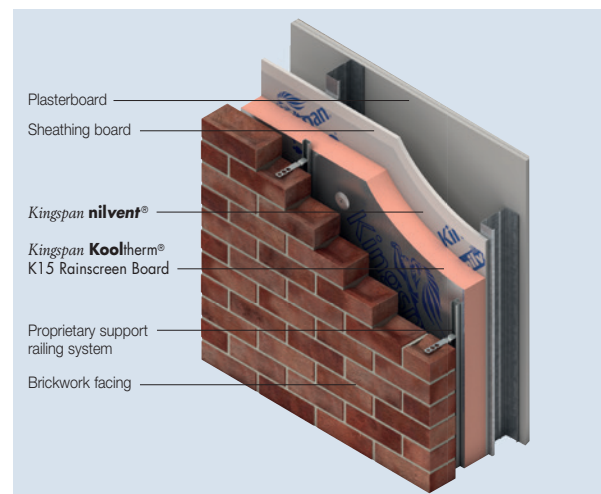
Brickwork Facing & Kingspan Kingframe® SFS.
